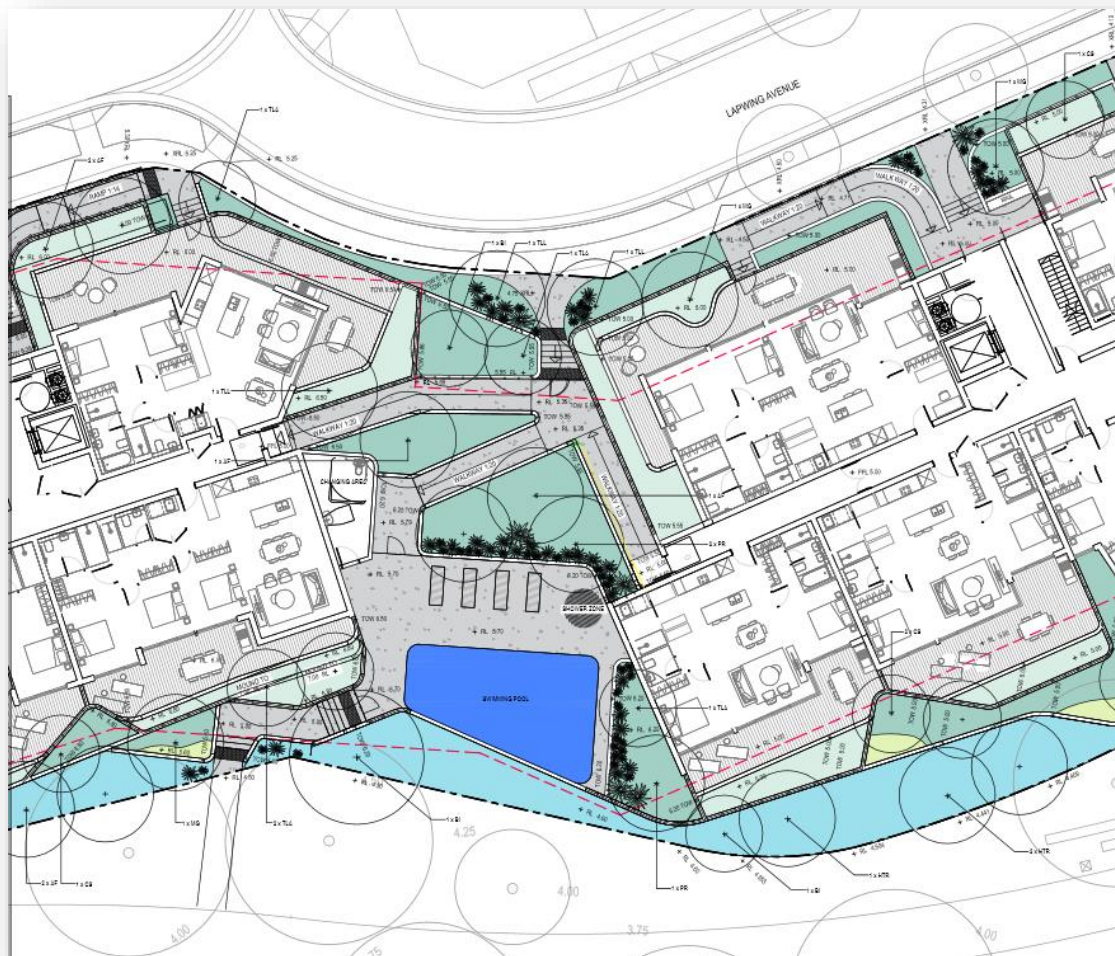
landscape plan detailing retaining walls between Building A and Building B.
